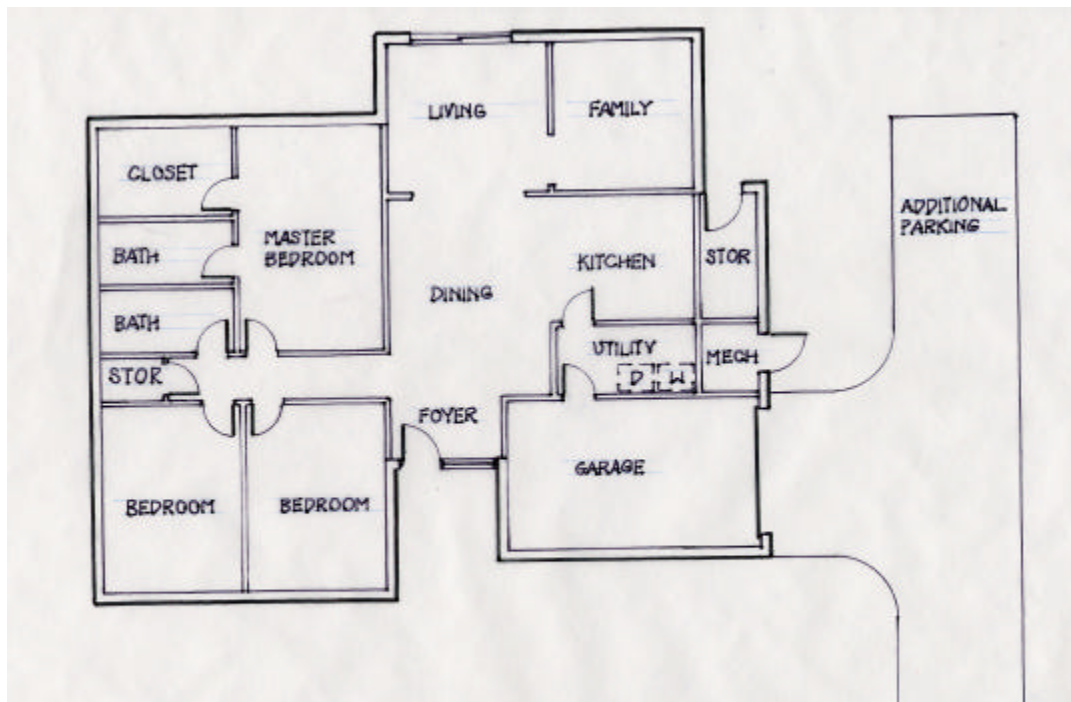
3 BR Unit – Floor Plan Diagram
